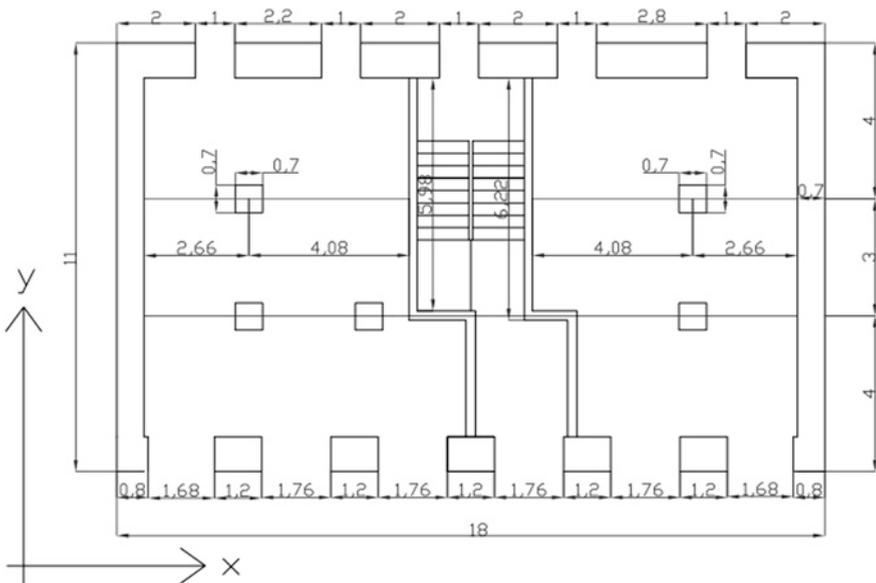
Sketch of the plan view of the building: ground floor (units in metres) [16]
